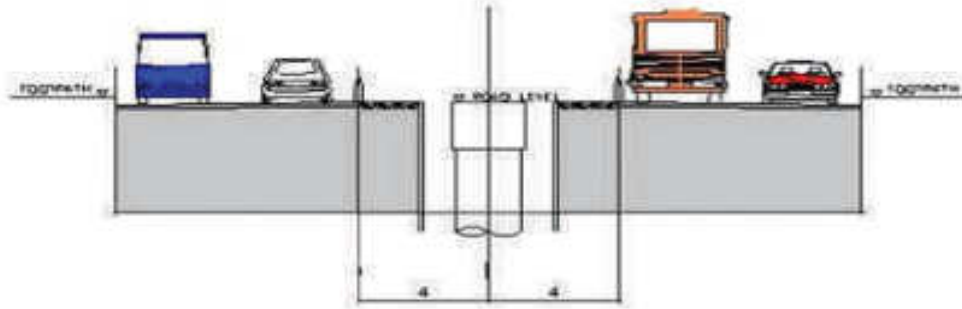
Construction Area for Pile, Footing and Pier
